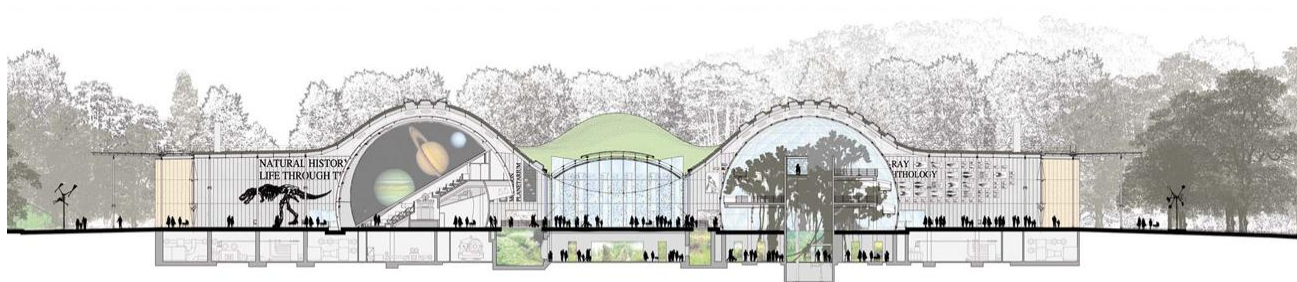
showing the 'living roof'. Source: Renzo Piano Building Workshop (n.d.)
